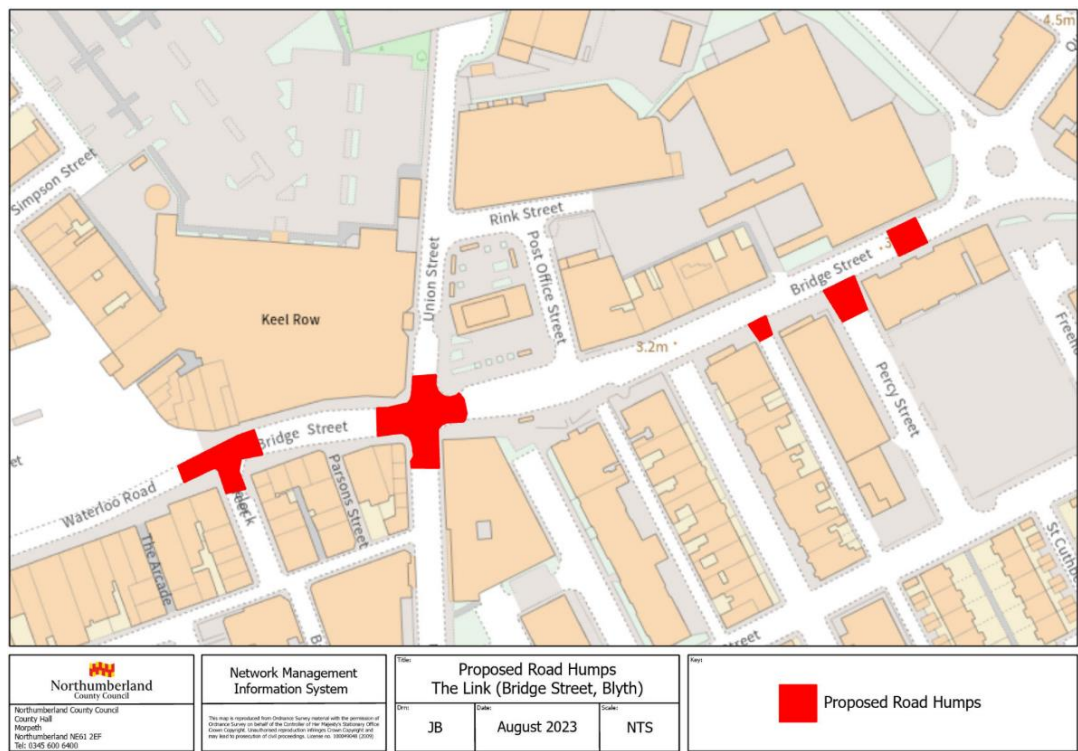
Proposed road humps at Bridge Street and its adjoining roads
